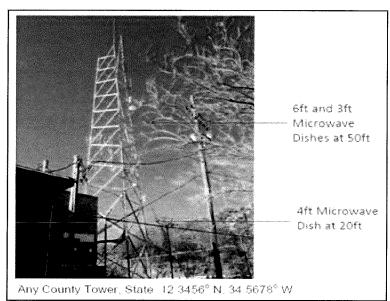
Ground-level photograph showing proposed locations of new communications equipment on an existing tower.
